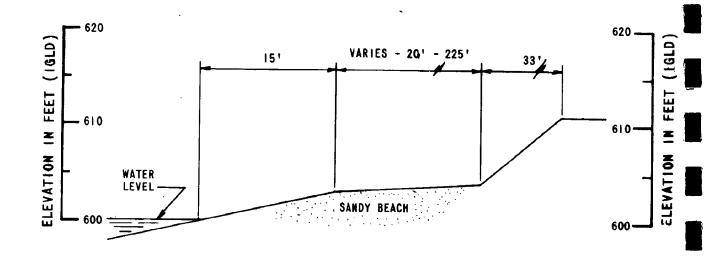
TYPICAL BEACH CROSS SECTION - WESTERN REACH NO. 16
